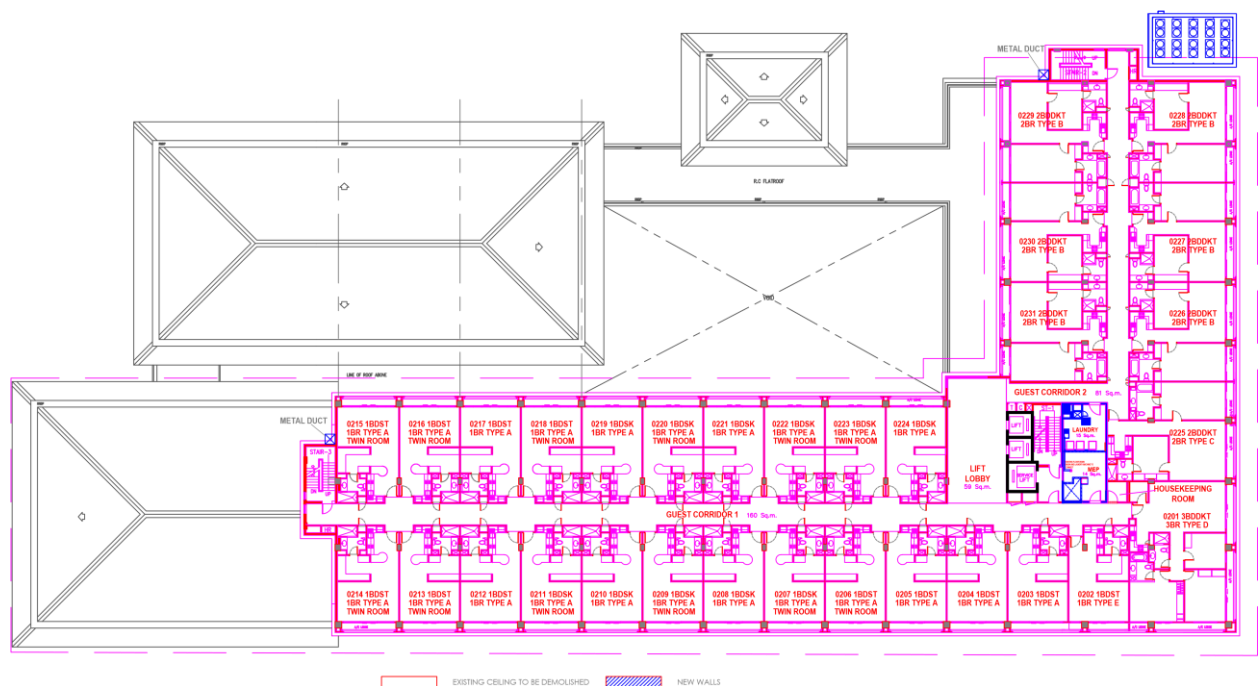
Floor plan of level 2,4,5,6 (Clear figure in Appendix-4)
